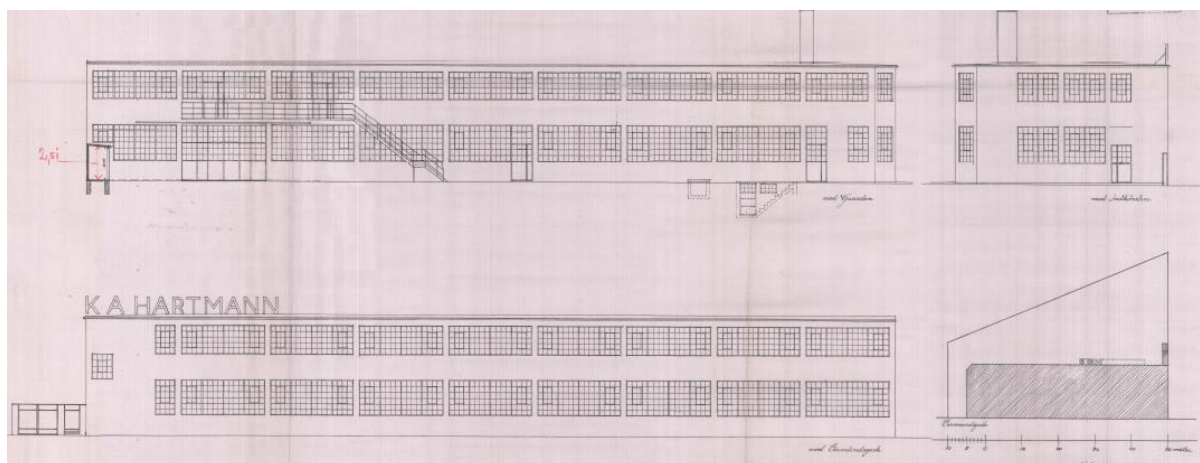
Original building drawings of the case building when it was built as factory in 1937.
